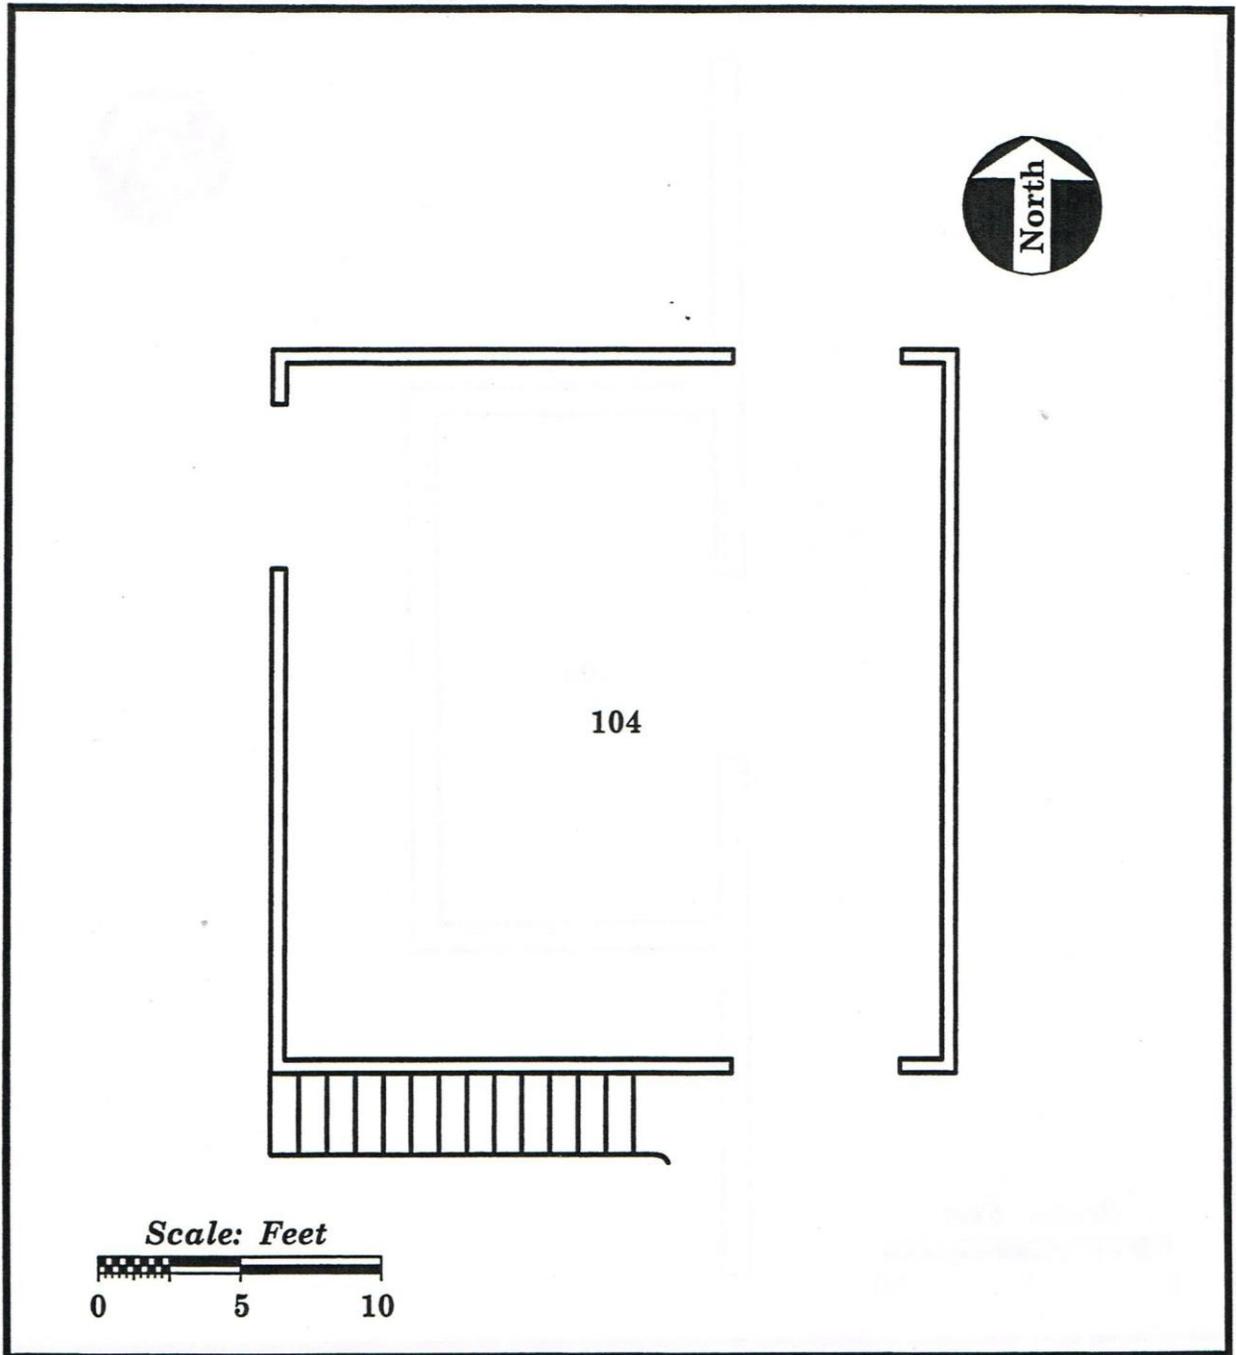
Building 817B, Facility Plot Plan, 1997 LLNL Archives, (Figure A-11)
